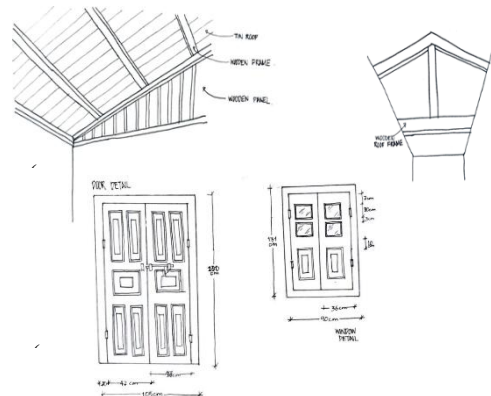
Details of typical Roof (b) door and window (Source: Authors)
